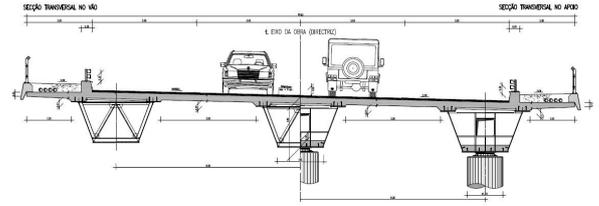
Deck mid-span and support cross-sections of viaduct over A5 [5]
